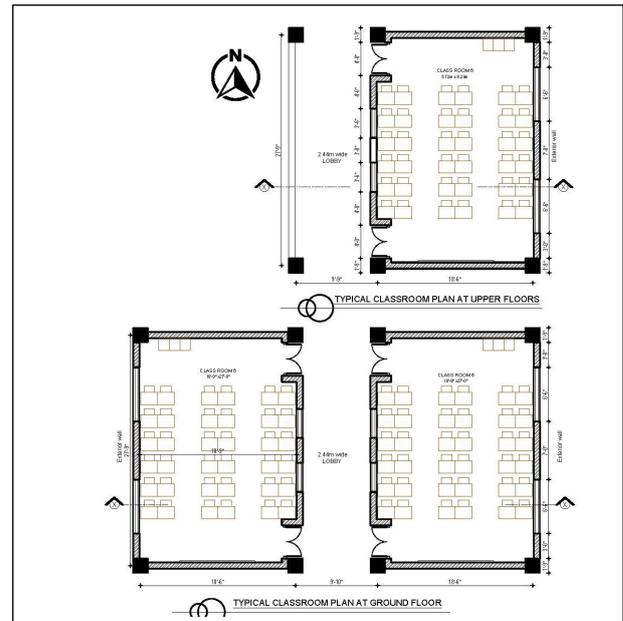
Typical floor plans of Durbar High Schools Classrooms
